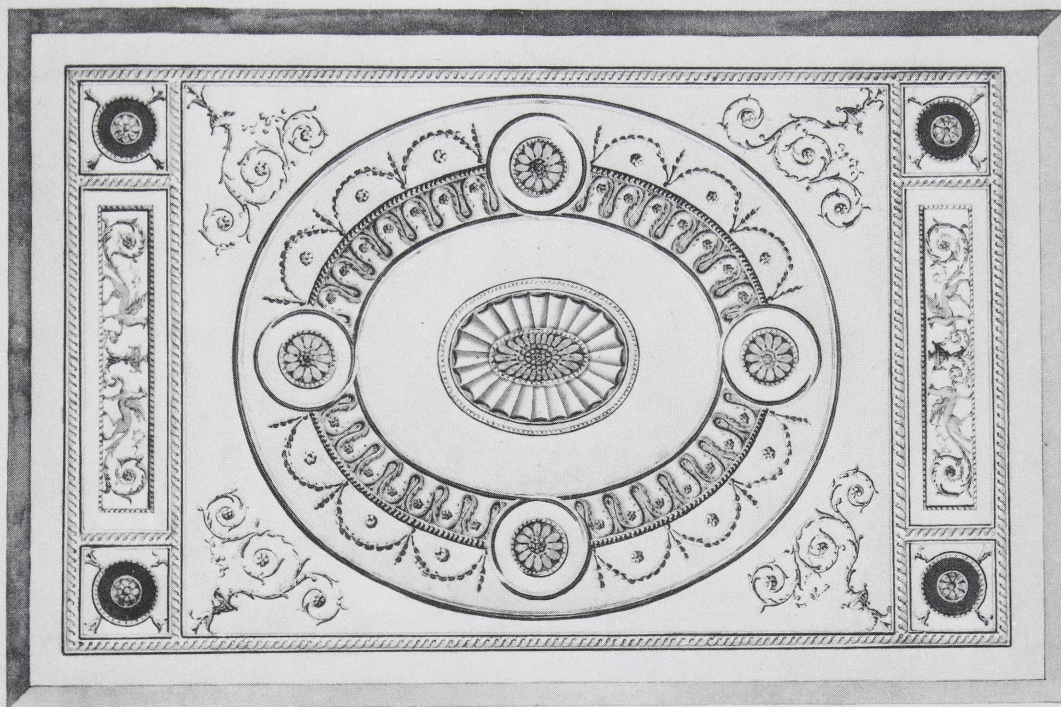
Robert Adam. Edinburgh, No. 7 Queen Street: Design for the ceiling of the first drawing room, 1770
